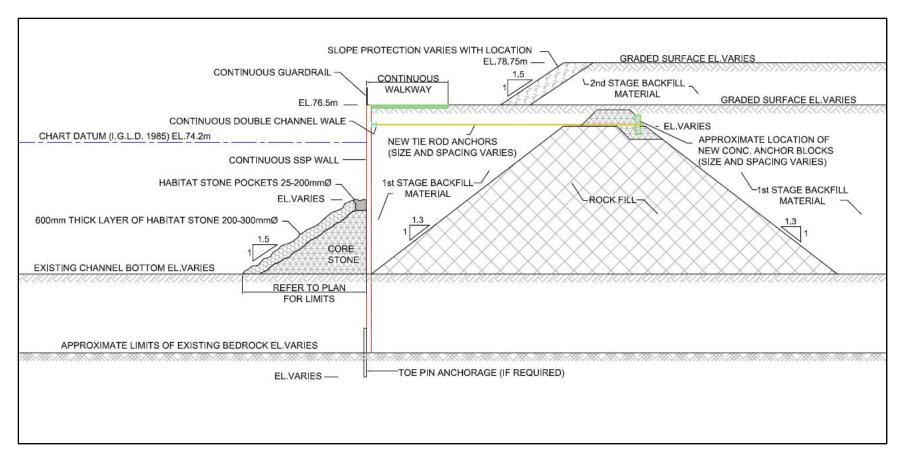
Typical Wall Toe Structure on SSP Wall
